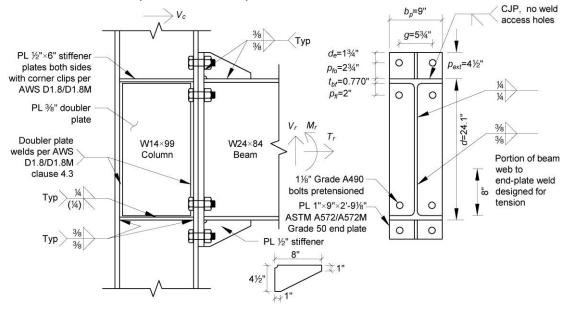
should be revised to include full-depth stiffener plates and a shortened web doubler plate in the column panel zone:
